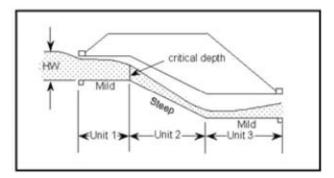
A - Three Unit Broken Back Culvert <u>(Source TxDOT, Hydraulic Design Manual, 2011)</u>
